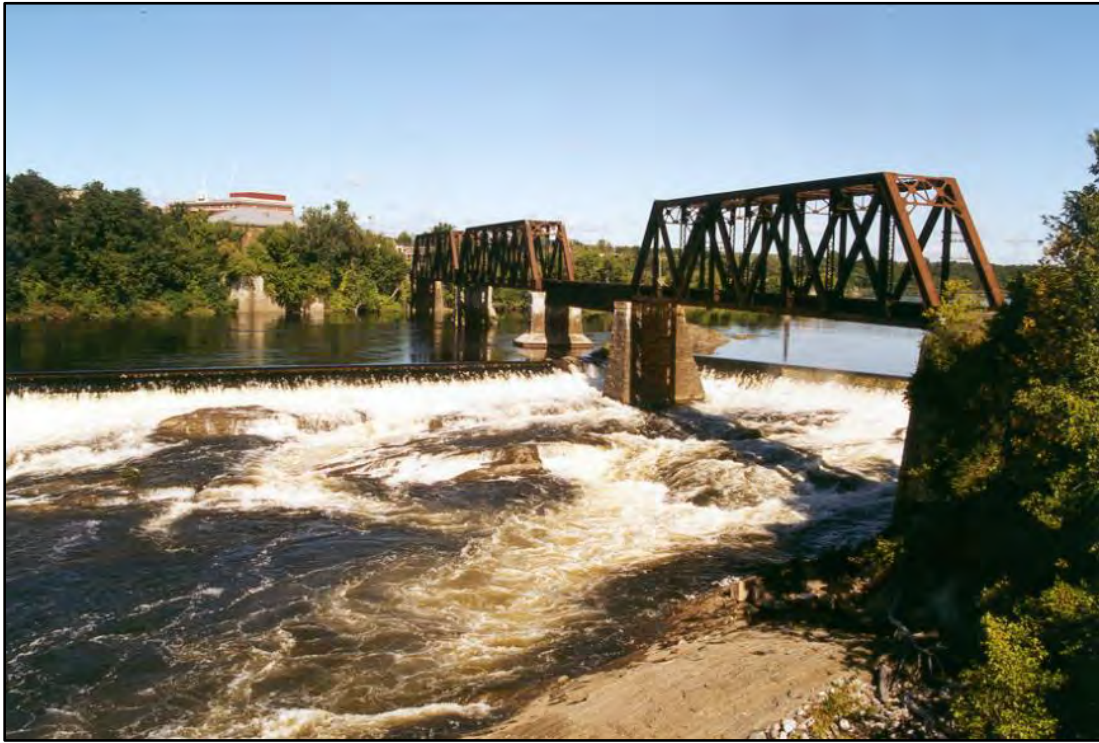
Bypass Area Looking North, Proposed Fish Ladder Placement Area.
